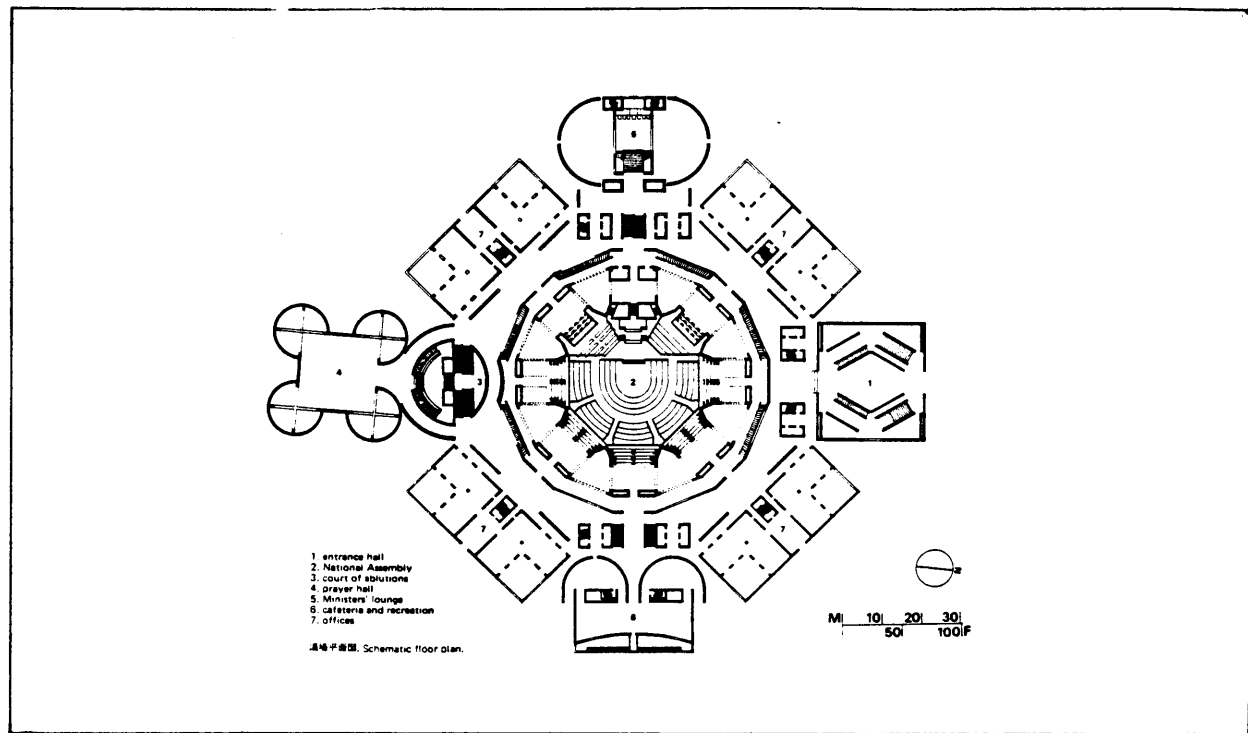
Floor plan of Sher-E-Banglanagar National Assembly Hall. Dacca. Kahn 1962-74
